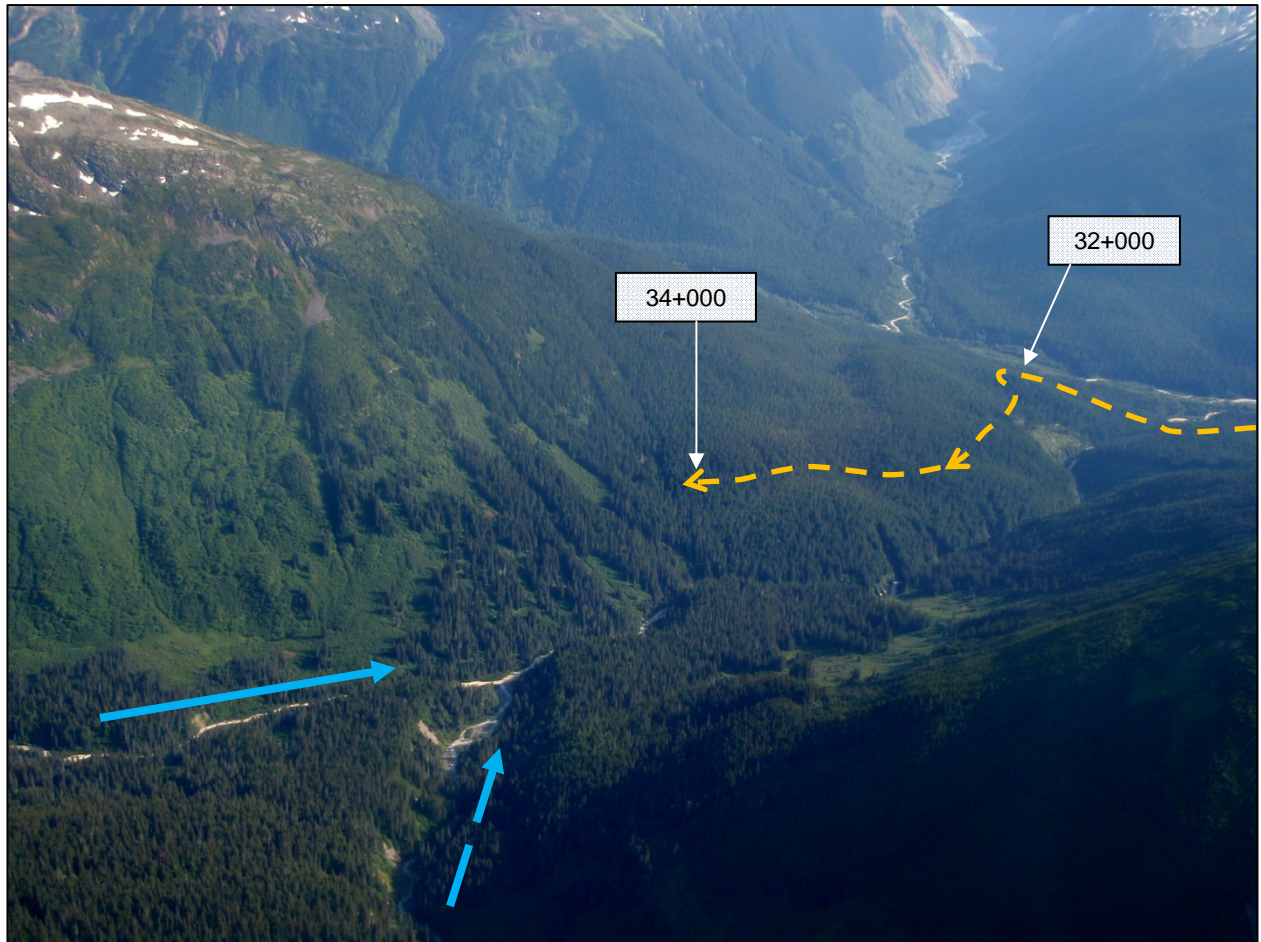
Coulter Creek Access Road – Looking downchain (west) down Sulphurets Creek.
